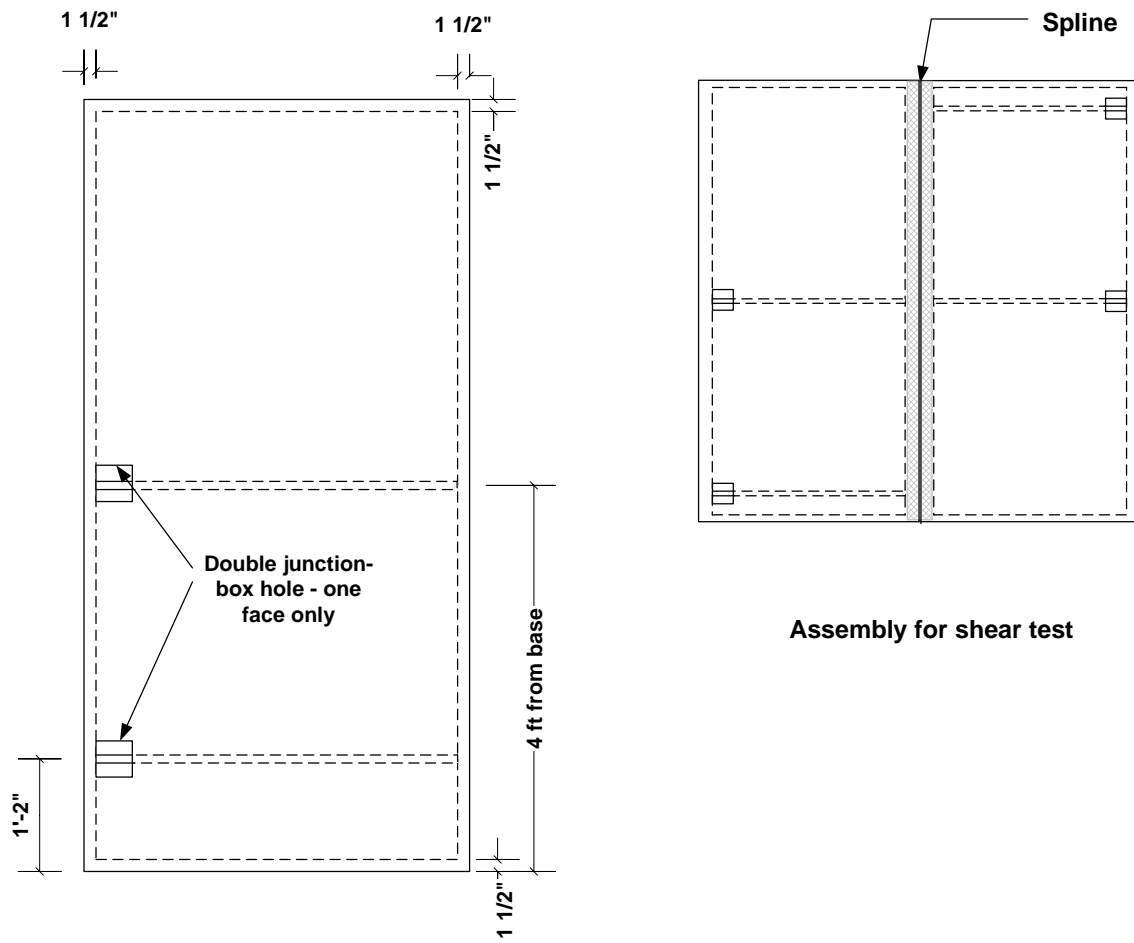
RACKING SHEAR TEST SPECIMEN AND ASSEMBLY
